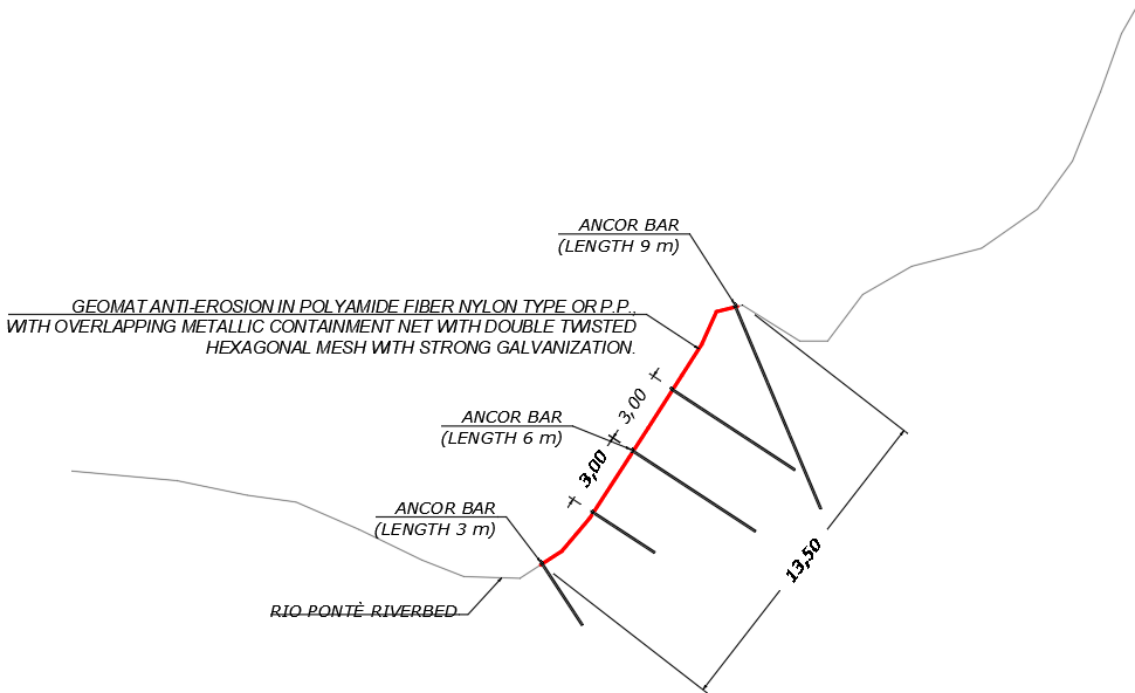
Profile view section A, A'. GEOMAT abutment A.
